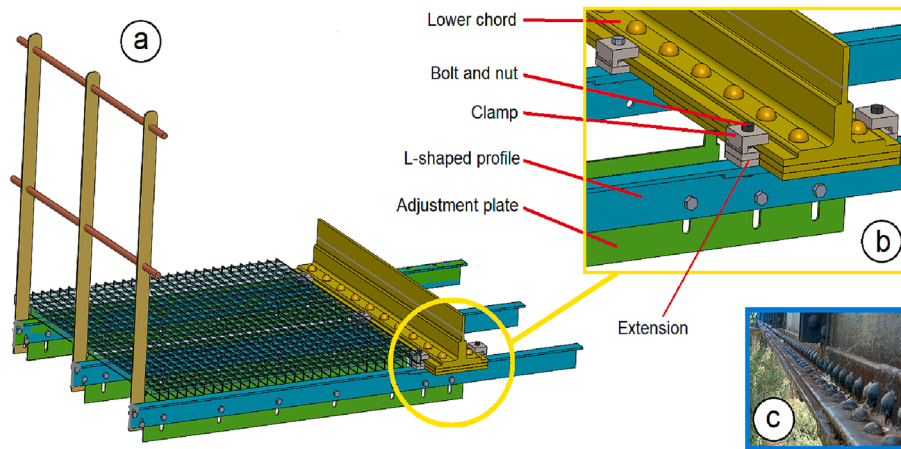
3D view of the developed walkway system a) Platform module mounted on a truss chord b) Detail of the L-shaped profile, adjustment plate, and clamps c) Detail of the flange of a truss chord.
